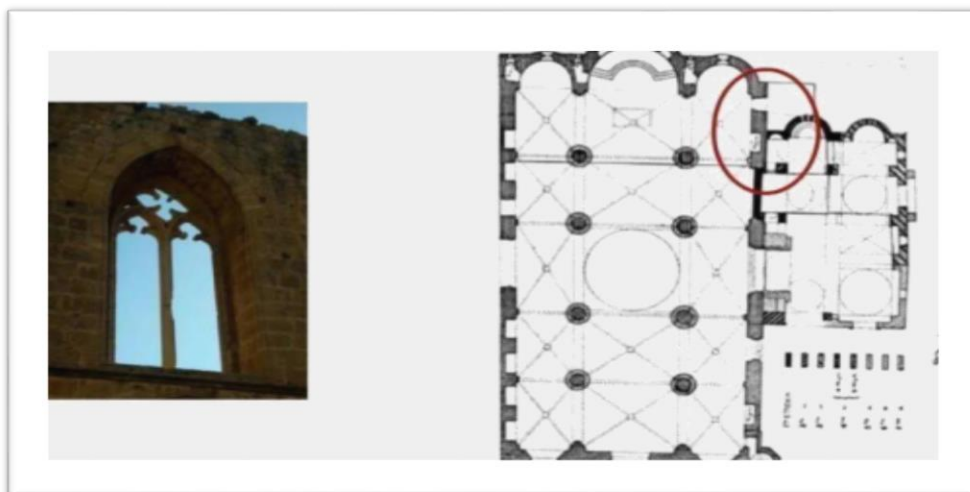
second window on the south wall and stone Tracy (I'Anson, 1883, Pirlanta,2014)
